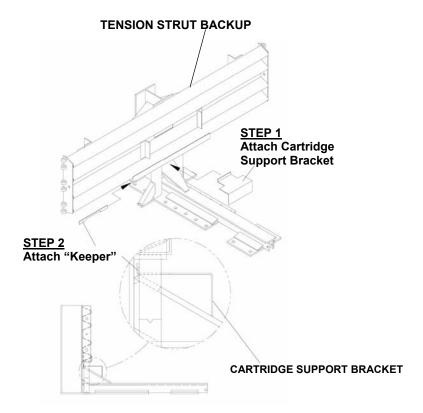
Cartridge Support Bracket Assembly (Tension Strut Backup)
